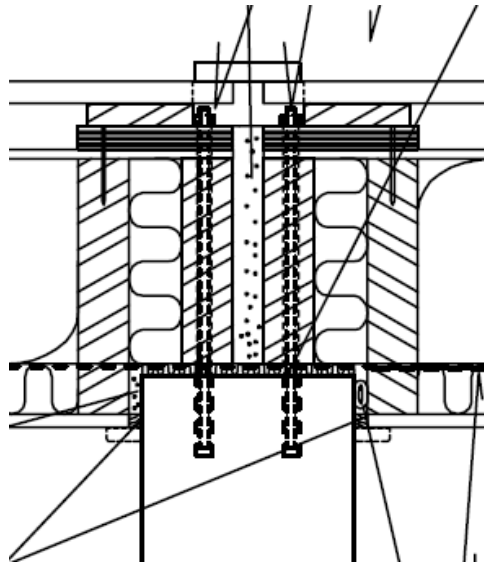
Wedge anchorage to the concrete wall. Nieminen A. 2014. Detail drawing 5.08.
